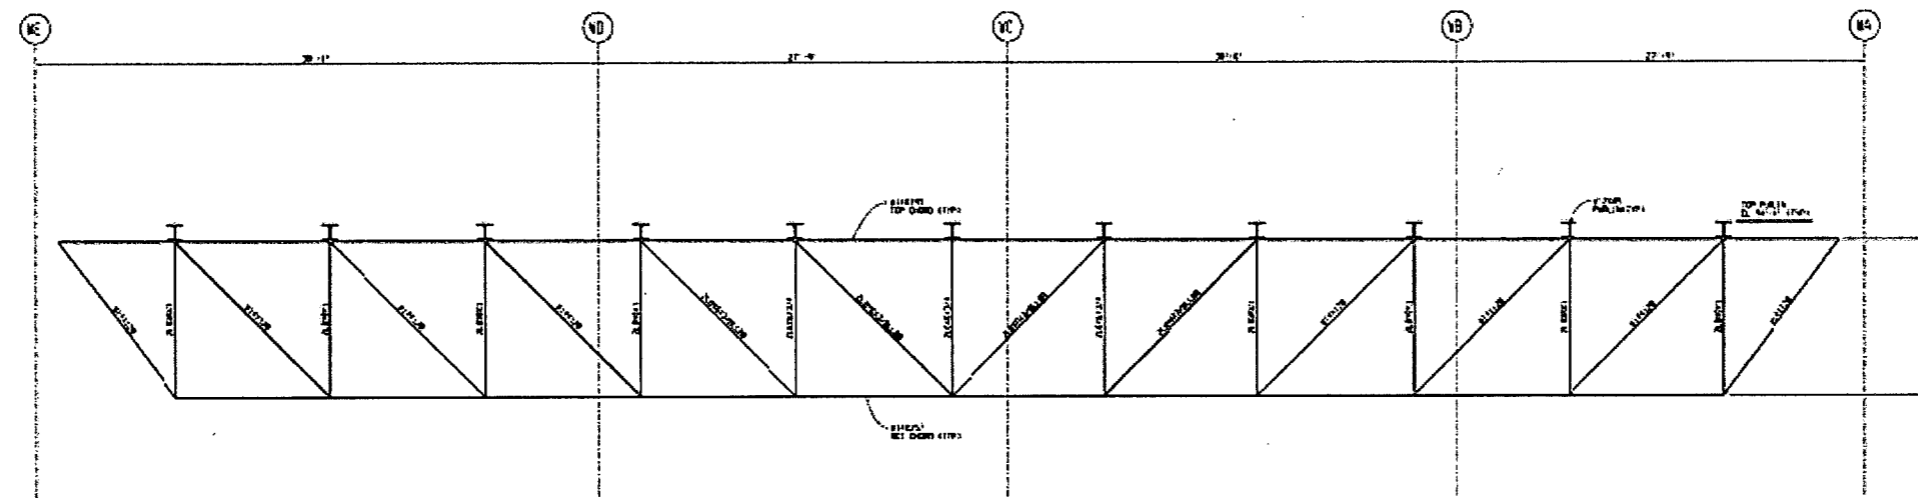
40 TYPICAL EAST-WEST SPANNING ROOF TRUSS BETWEEN COLUMN LINES W7-W8 (ELEVATION VIEW)
